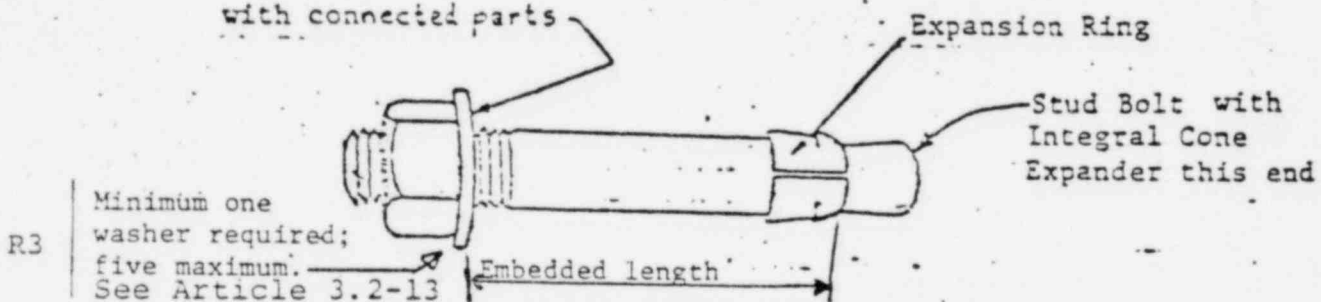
Typical Wedge Type Expansion Anchor with Cone Expander
